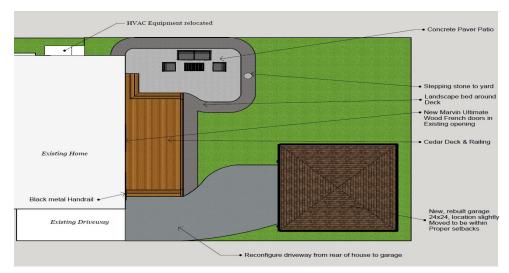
, from Applicant, proposed site plan, showing proposed new garage location, driveway, deck and patio.
